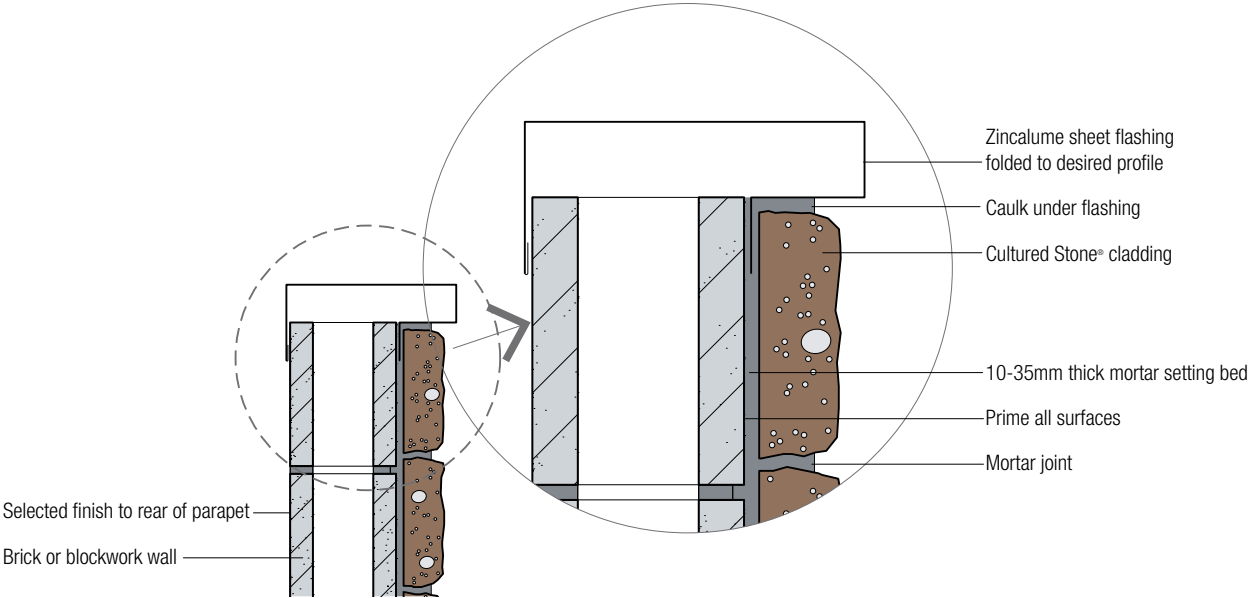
Brick or Block Work Parapet Flashing Capping - Section (Dwg # CS-11.03)
